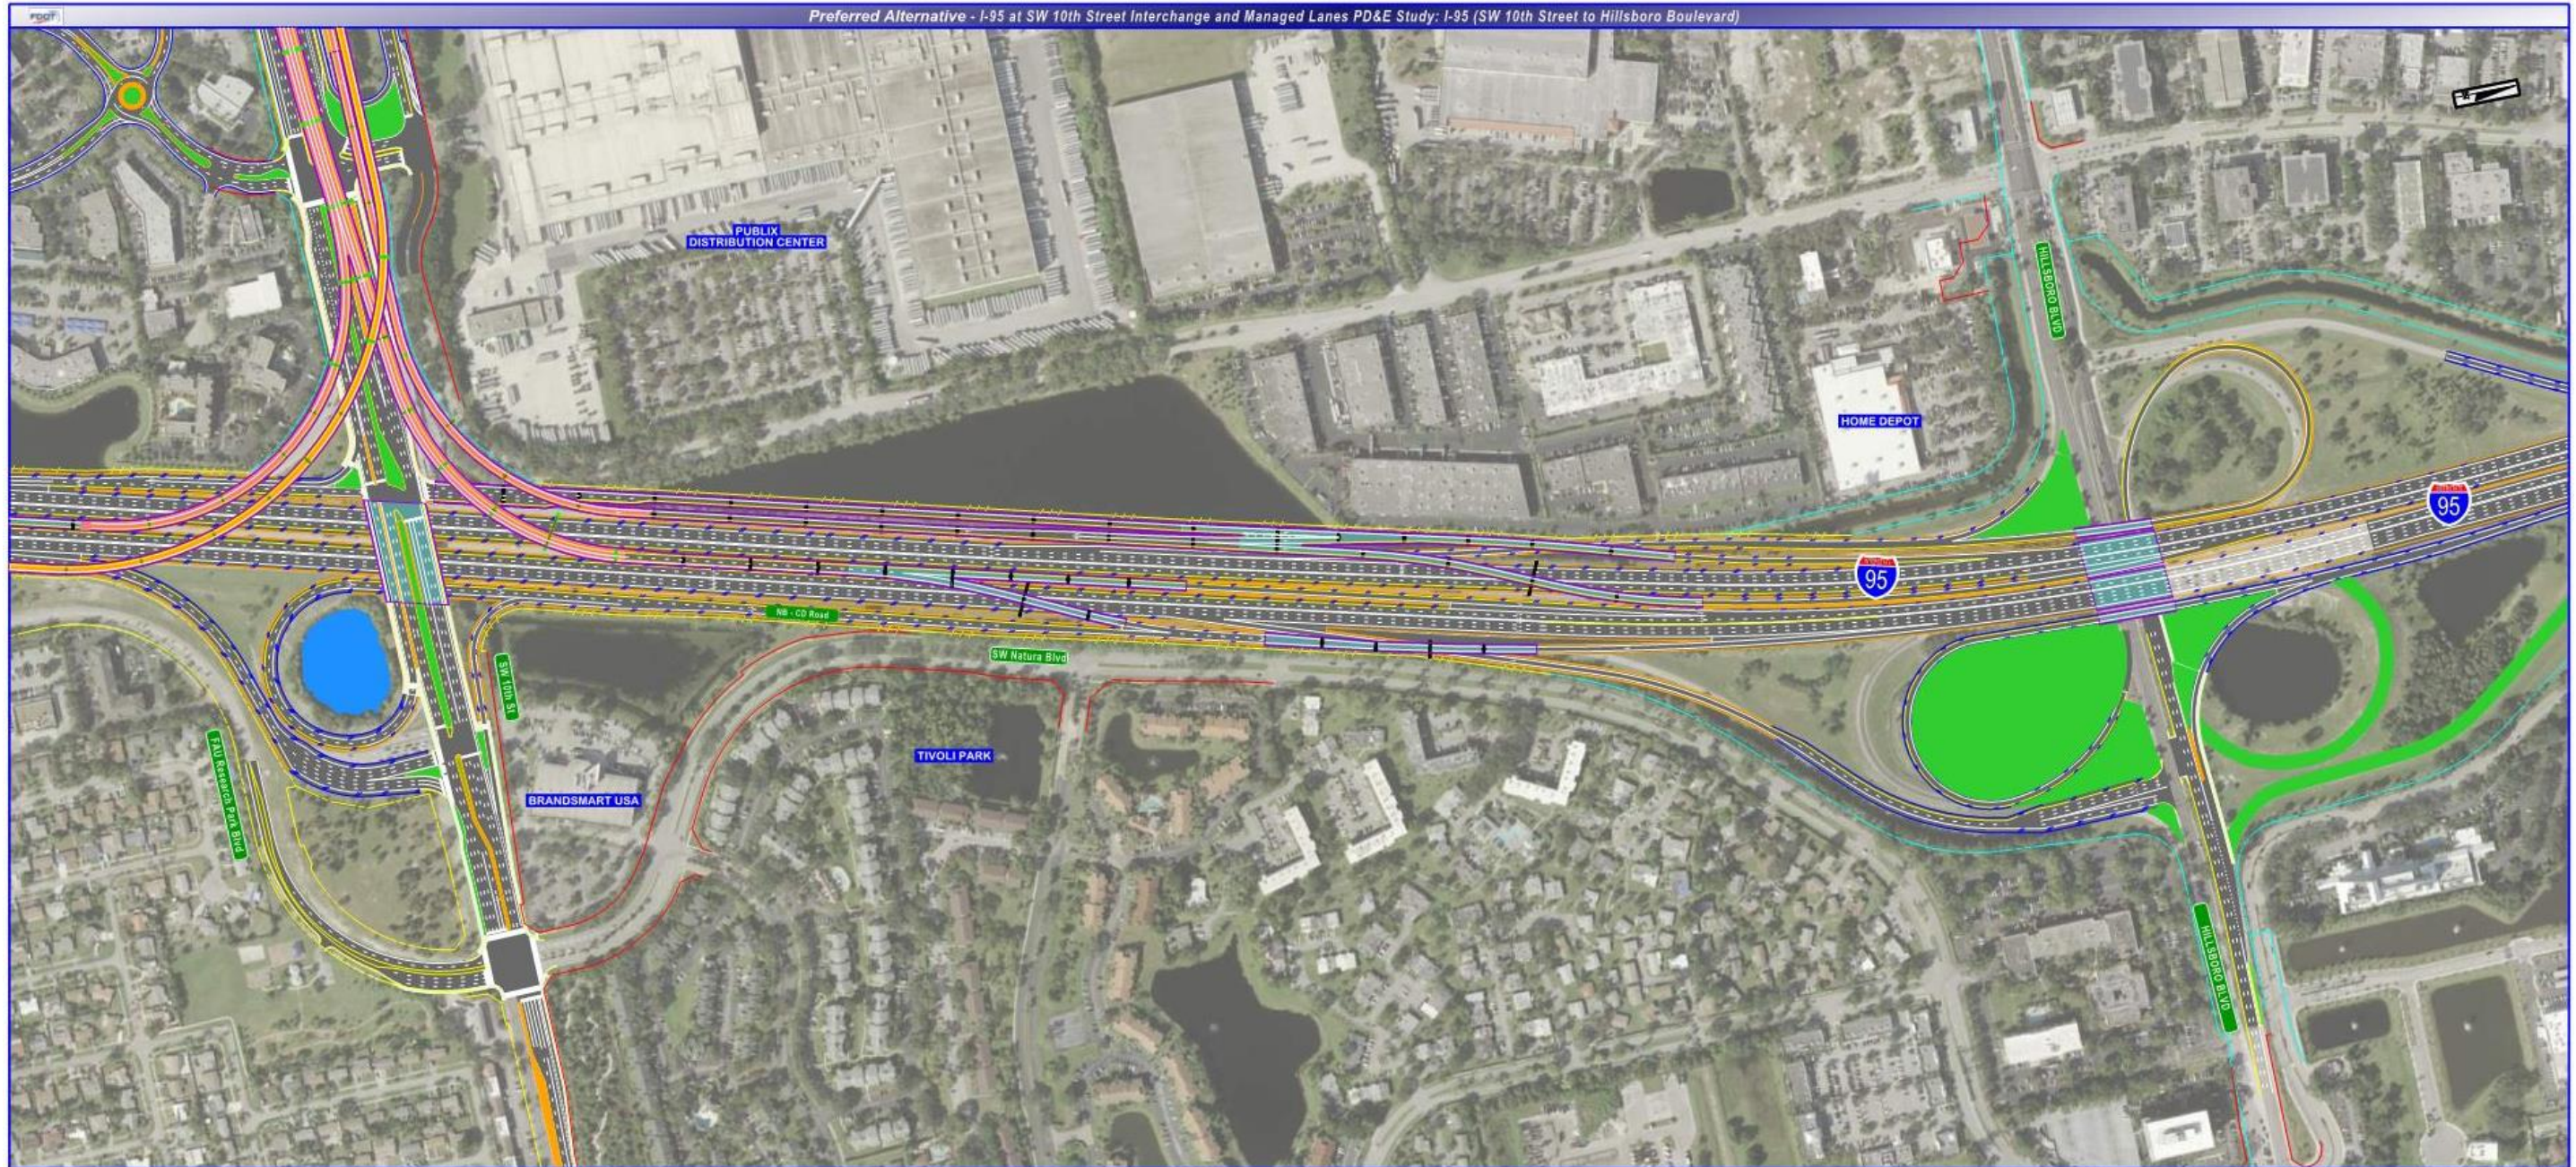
3: I-95 – Preferred Alternative Concept Plan (North of SW 10th Street)
